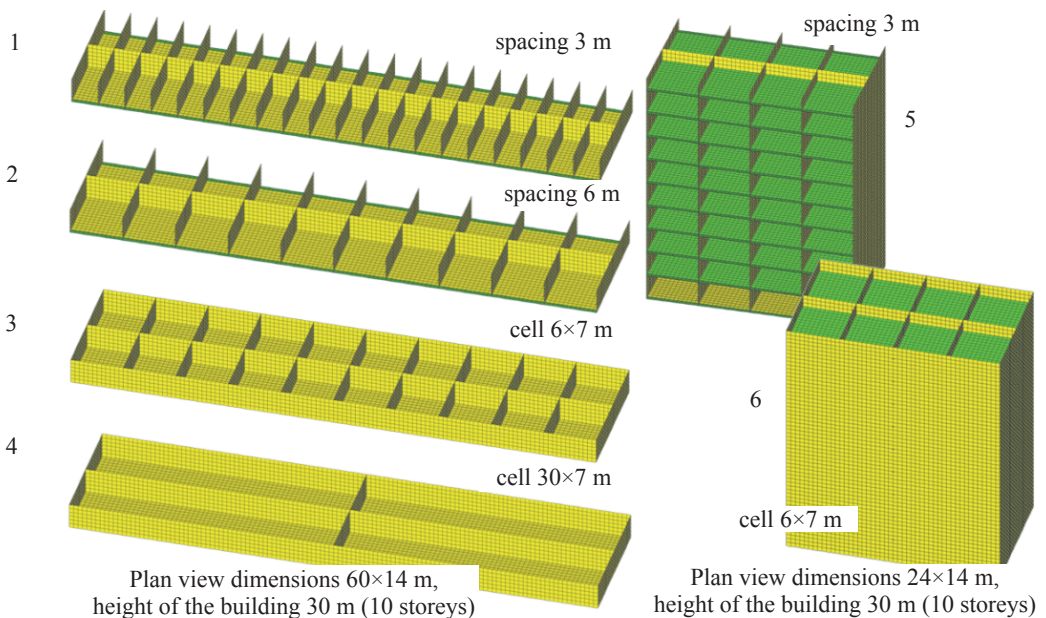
Numerical modeling of idealized structural layouts of buildings with different structural strengths (extended buildings: 1, 2 – with transverse bearing walls; 3 – cellular type; 4 – with longitudinal bearing walls; “free-standing” (“dot”) buildings: 5 – with transverse bearing walls; 6 – cellular type)
